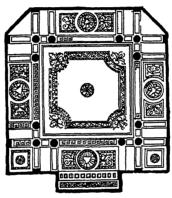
Ceiling Plan of St. Mary's Woolnoth, London.
